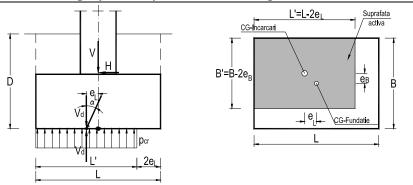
Shallow foundation with oblique load due to horizontal load.
